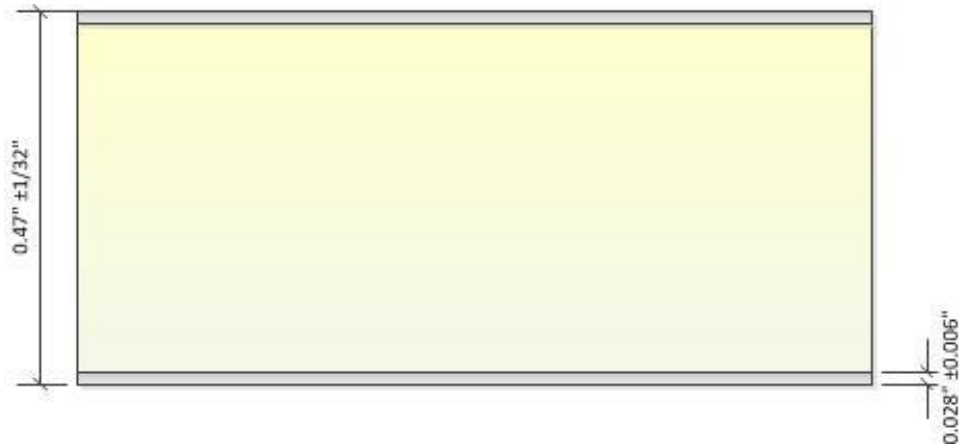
1/2-in. GoBoard® Thickness Dimensions
